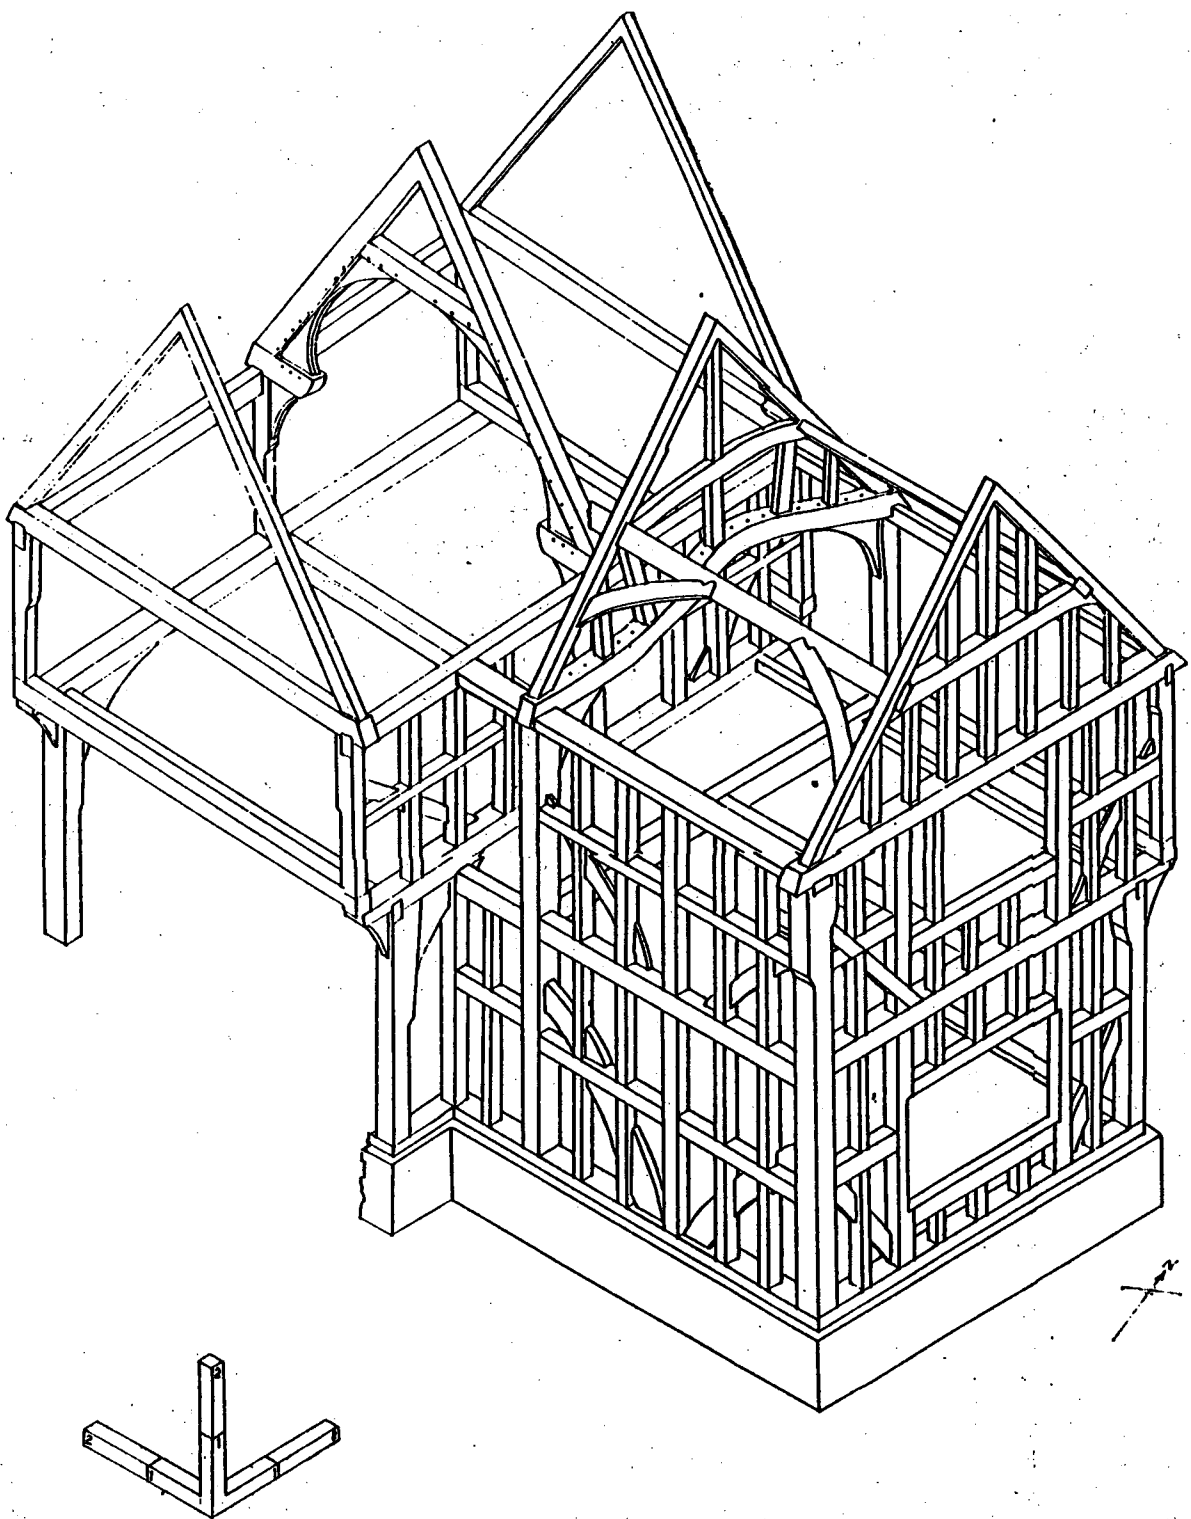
Isometric drawings of Buildings 4 & 5, Chantry House,
